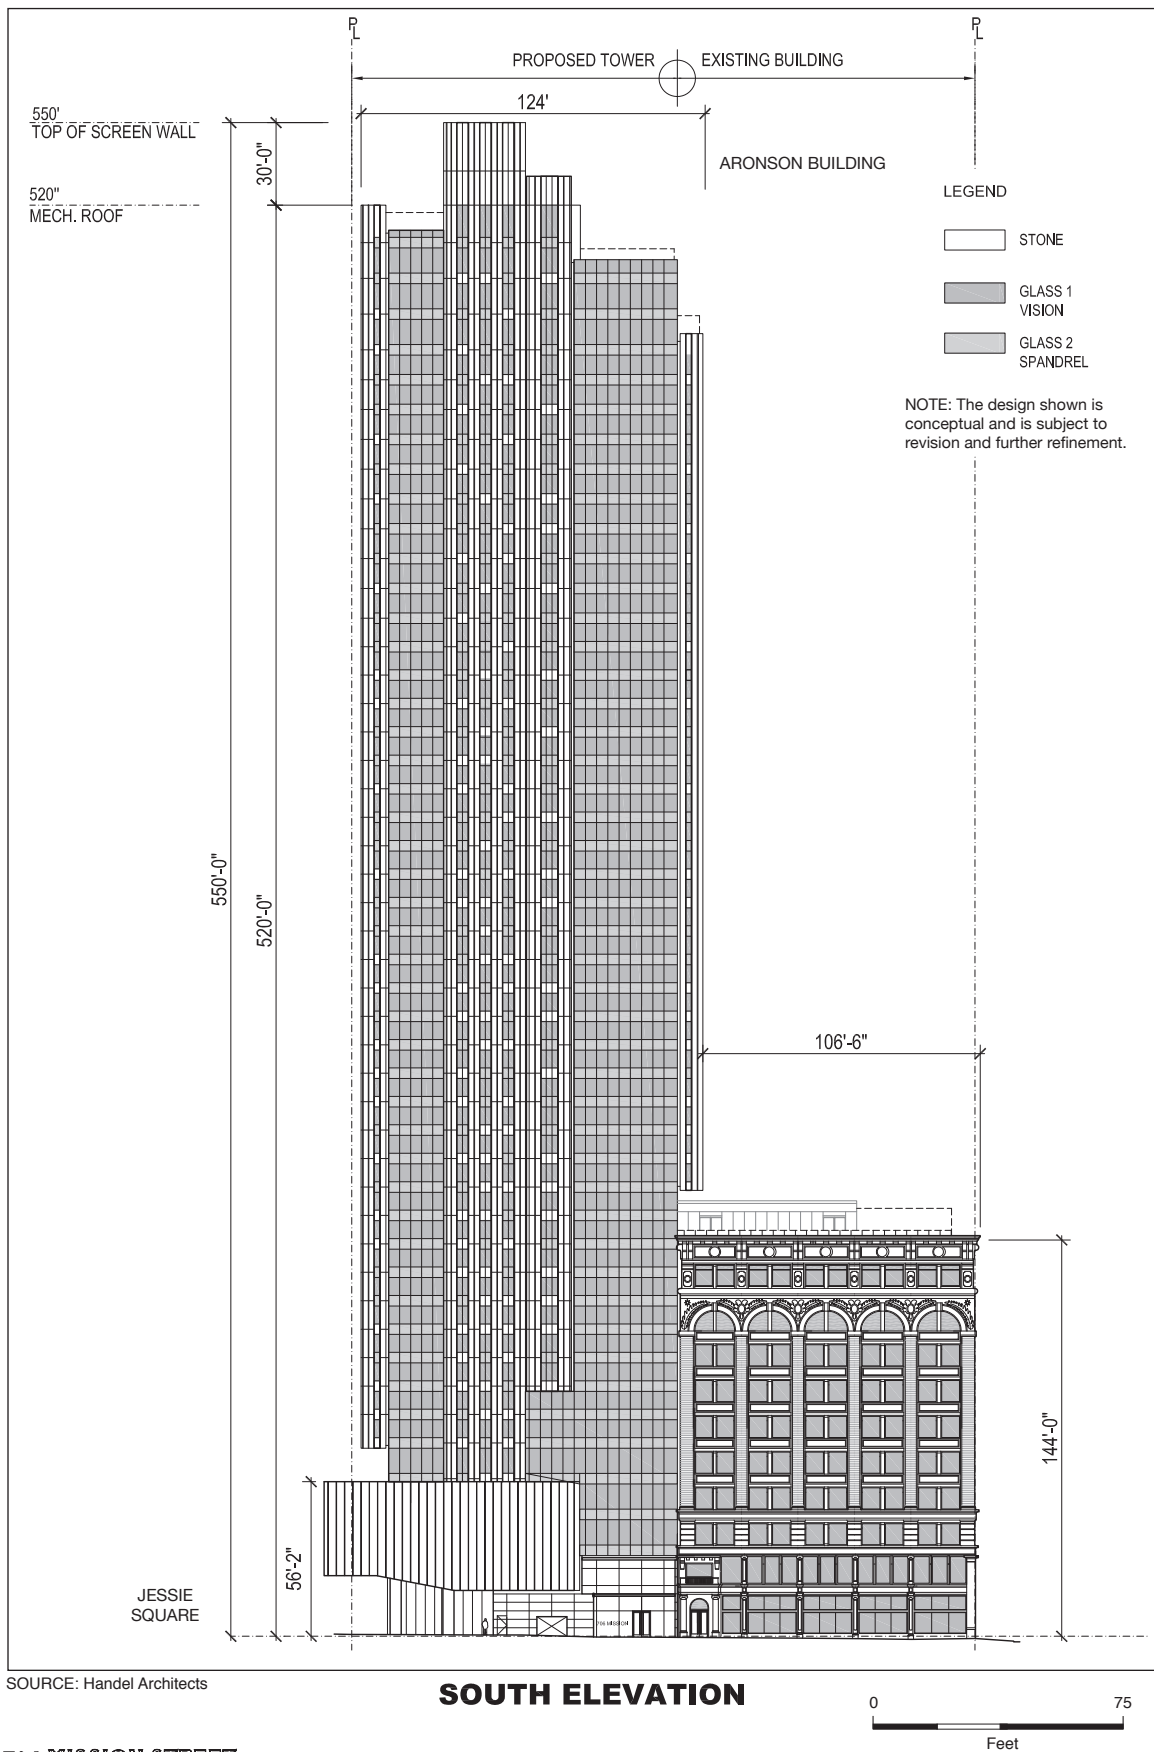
CONCEPTUAL SOUTH ELEVATION
